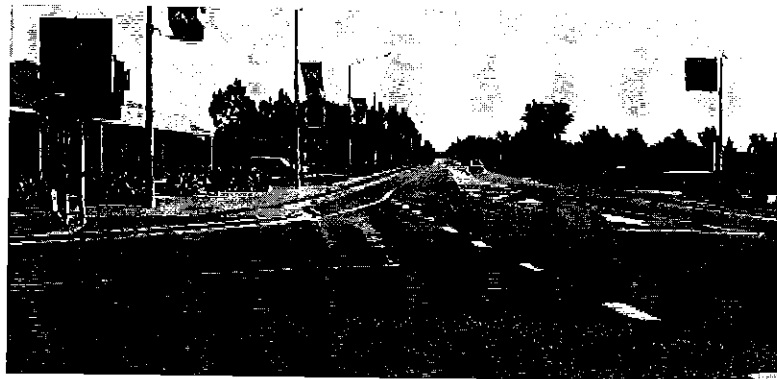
West Coast Road / Halkett Road Intersection, looking northwest
